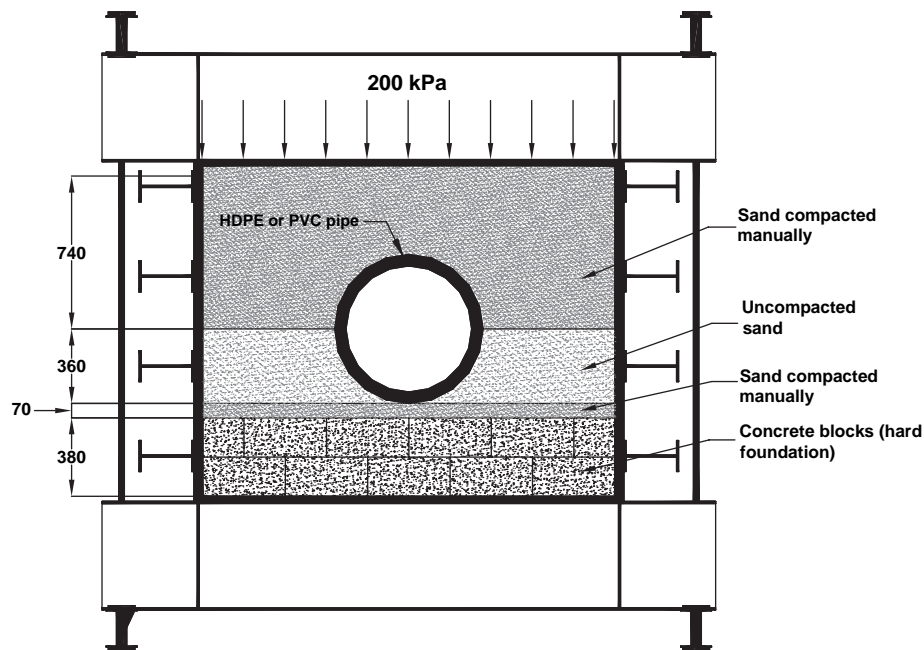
Cross-section showing biaxial test cell. Backfill geometry of Tests T3 and T4 are shown (measurements in mm).
